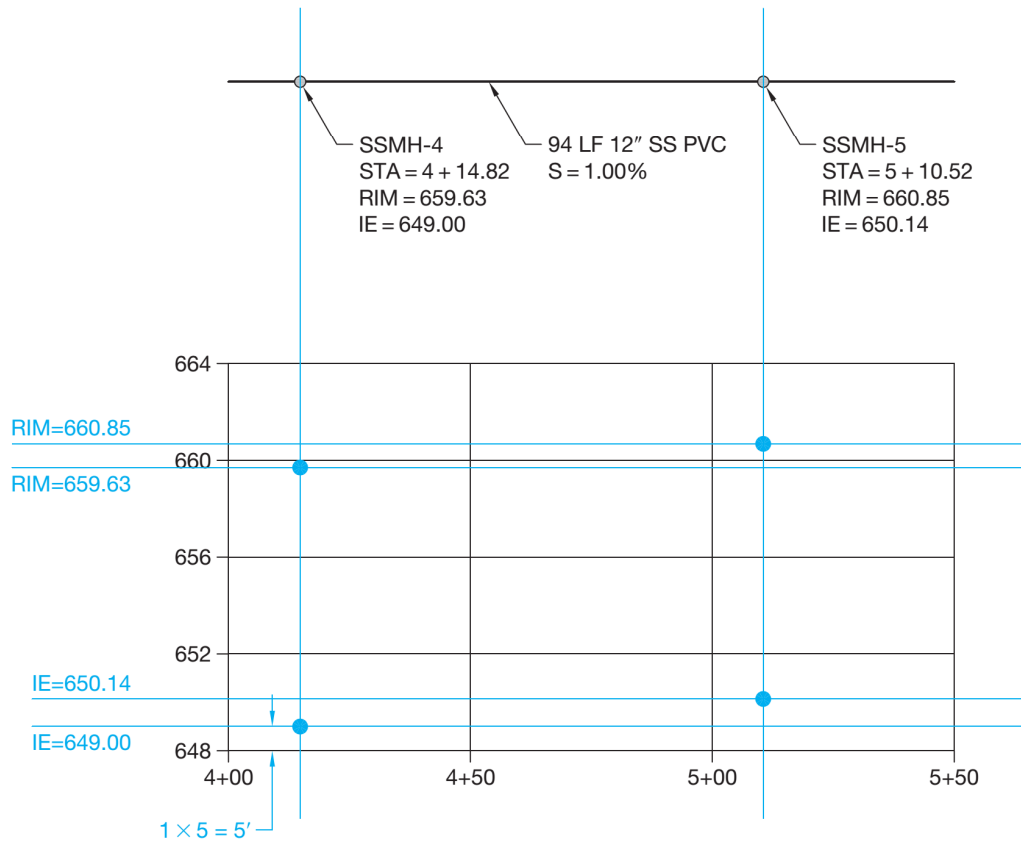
In the profile, locate all elevations required at manholes, such as rims of the manholes (RIM) and invert elevations of the pipe (IE).
